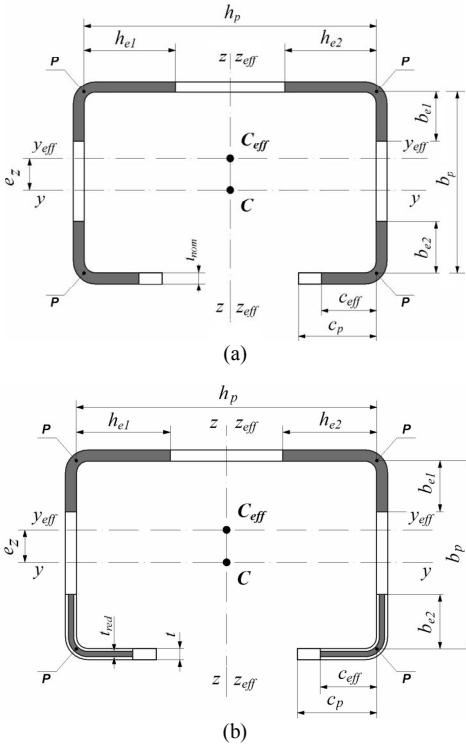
Construction of the “effective” C-profile cross-section of the cold-formed structural members according to the design code: (a) – at the first stage; (b) – at the second stage
